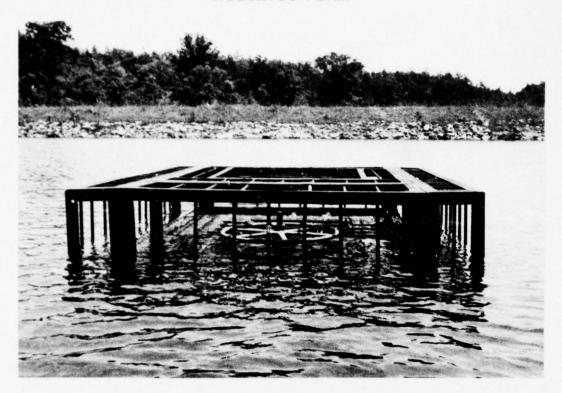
Principal Spillway Head Tower with Sluice Gate Hand Crank
